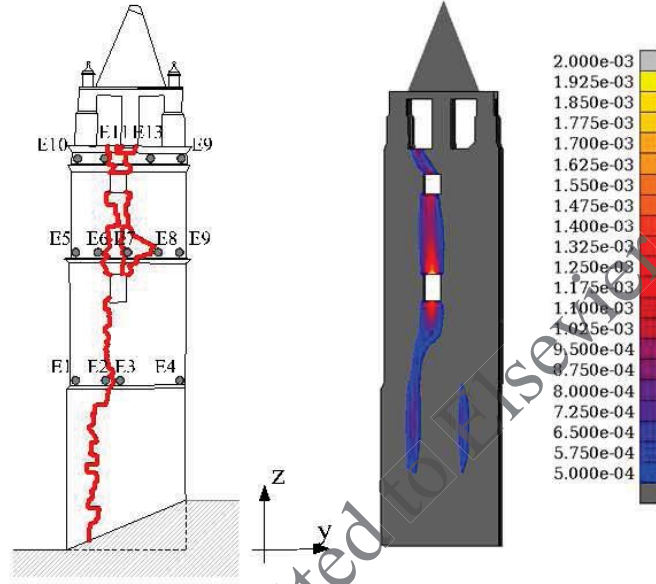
Mogadouro tower East façade, surveyed (on the left) and numerical (on the right) cracking pattern.
